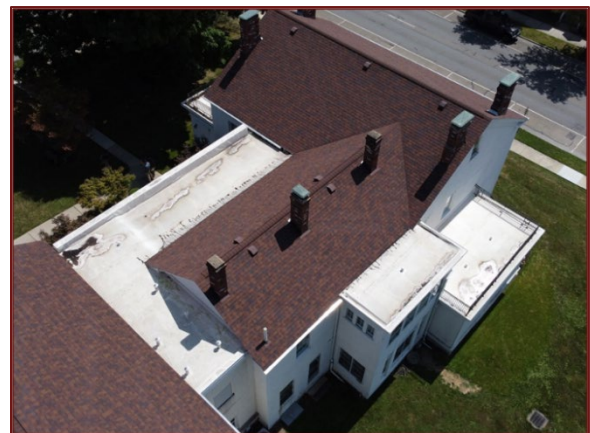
Aerial image of Rombach Place roof, facing southeast, 2024.
